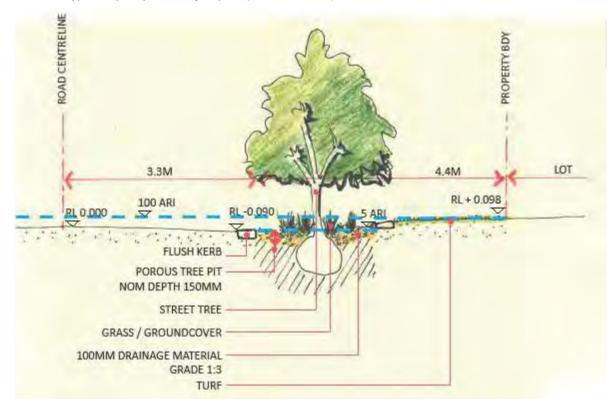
Typical half road section—no footpath (Scale 1:25@A3)
